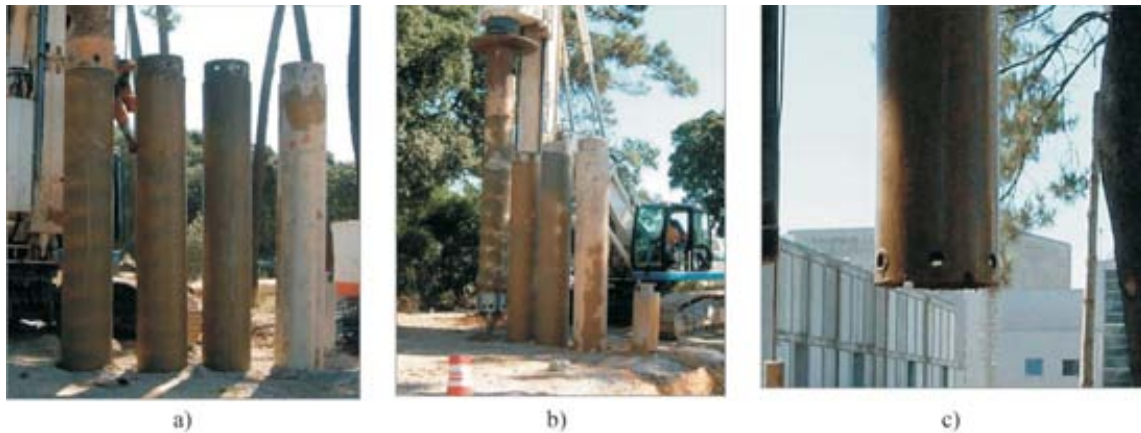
a) and b) Steel drive tube; c) Detail of the metal drive tube base (Costa Esteves, 2005).
